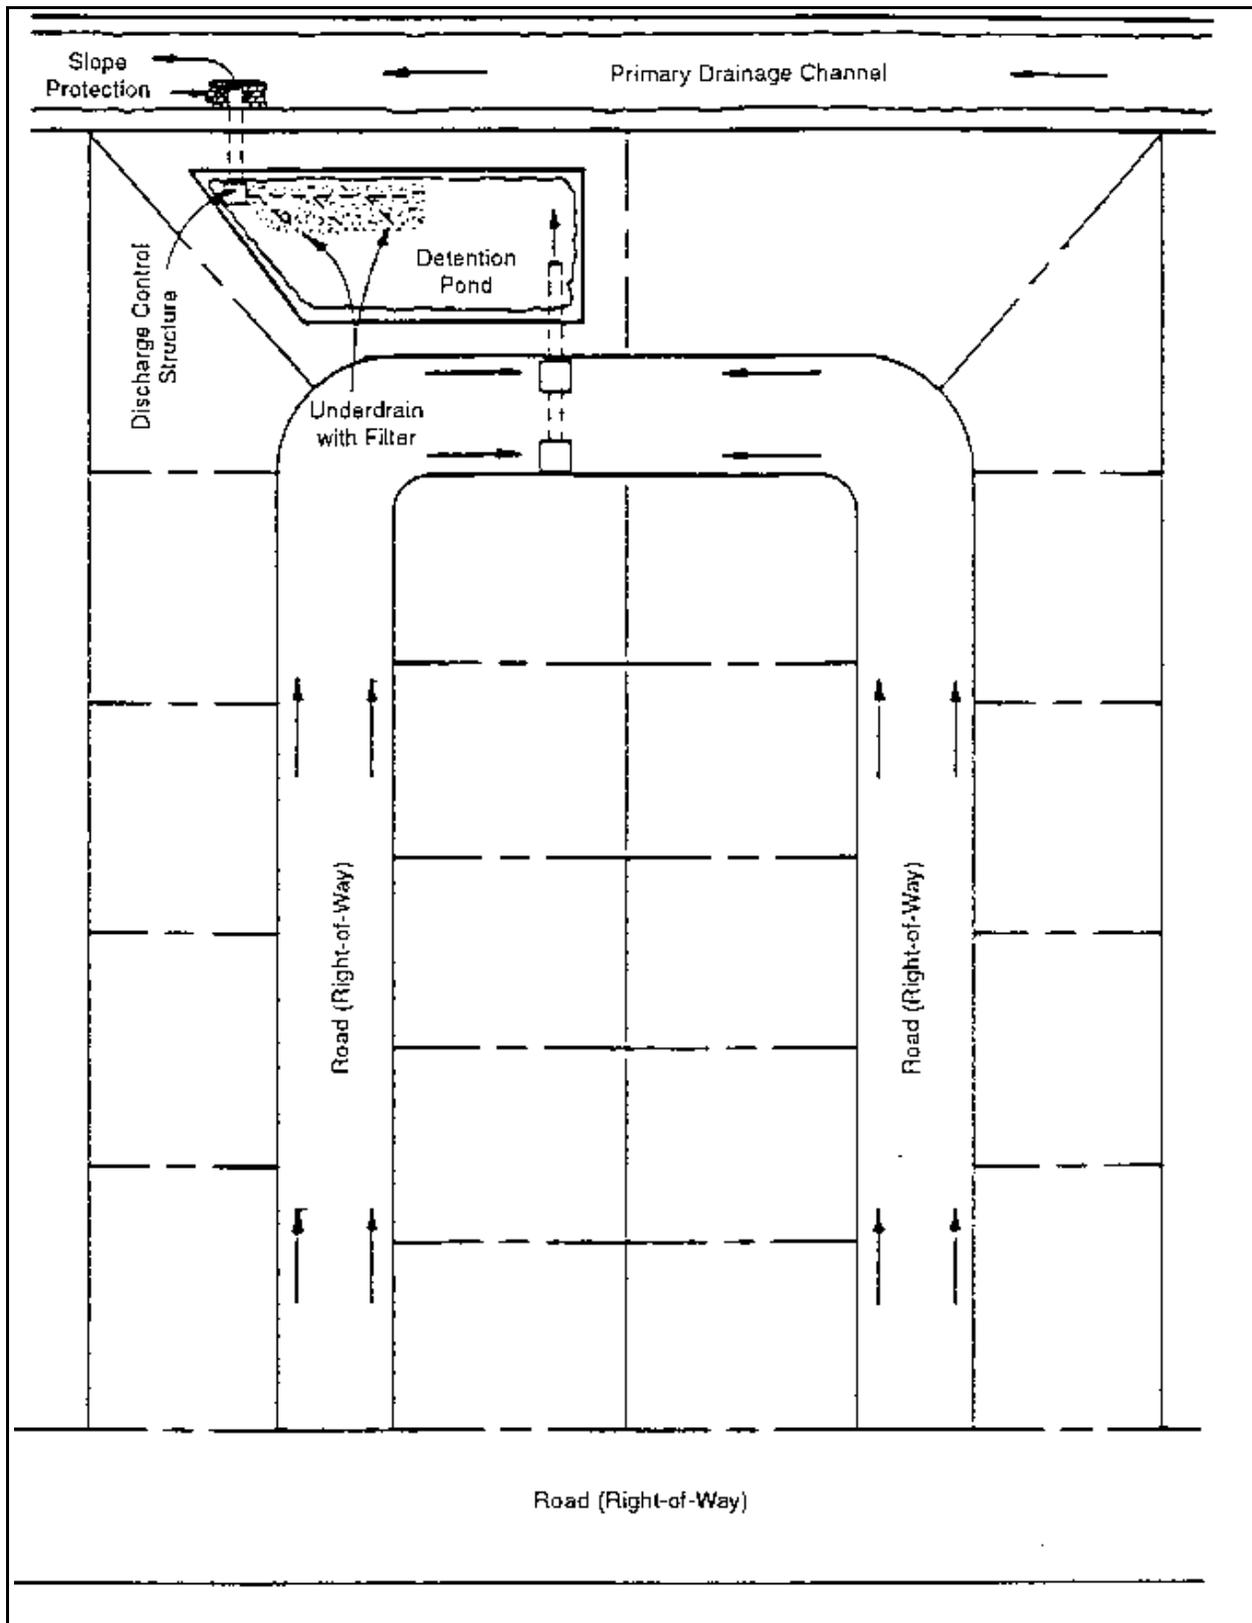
Typical Subdivision Layout Showing On-Line Detention Pond and Outfall
